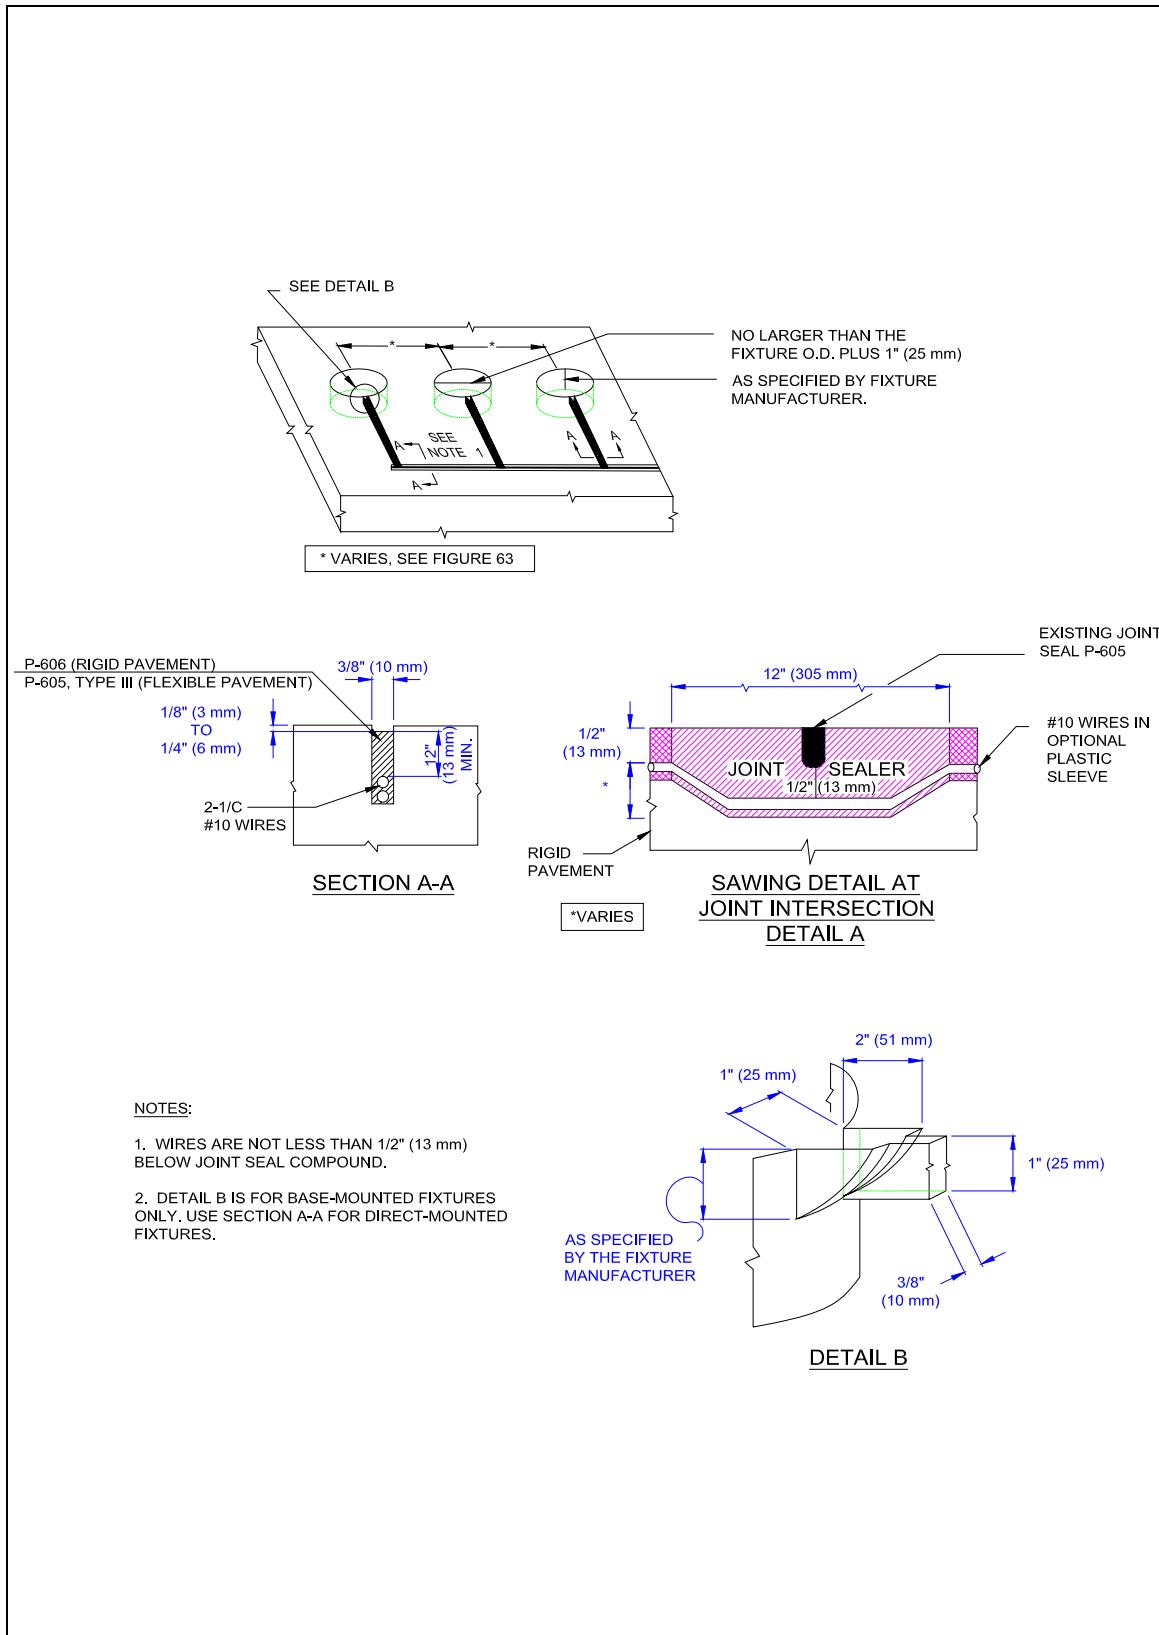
Sawing & Drilling Details for In-pavement Land & Hold Short Lights
